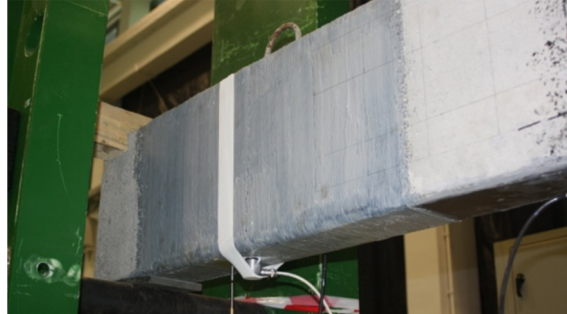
Passive reinforcement of reinforced concrete beams using CFRP tapes anchored with a mat CFRP
